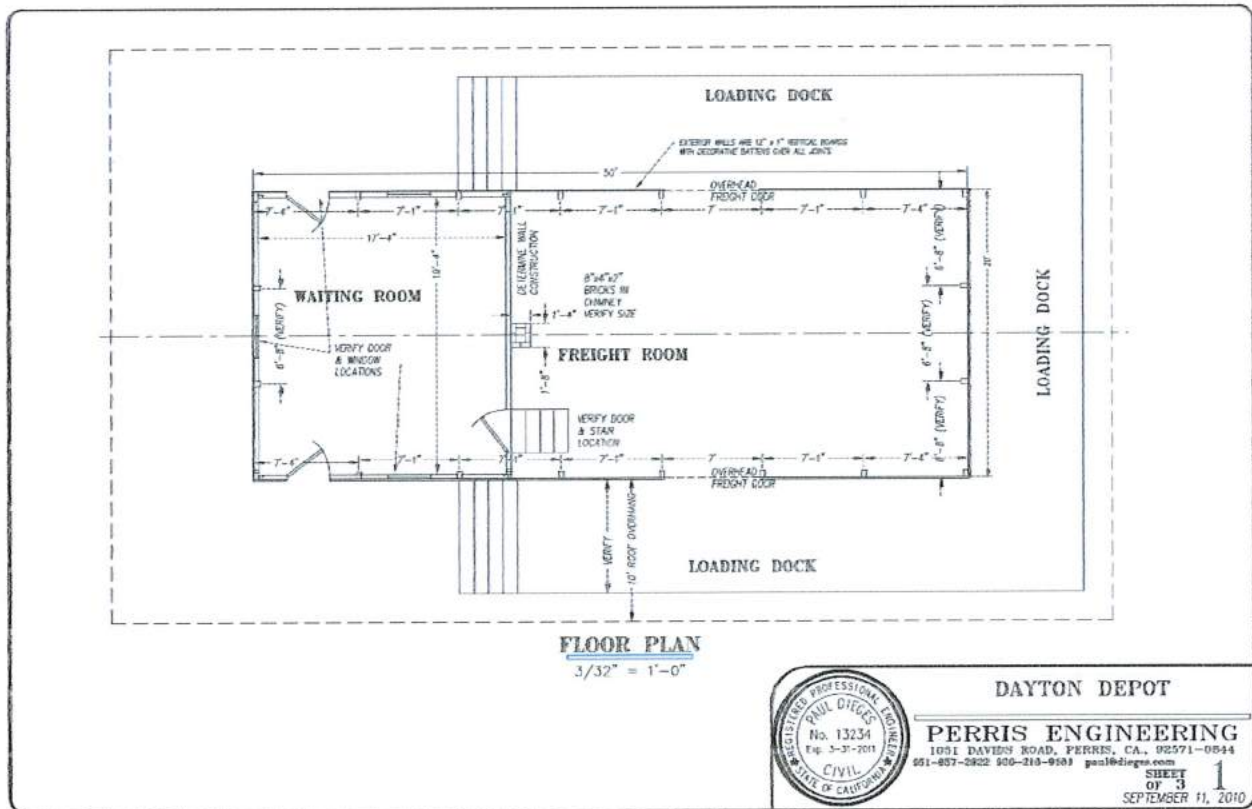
Floor plan drawn by Paul Dieges of Perris Engineering showing two main rooms of depot, passenger ticket and waiting room to left, freight room to right.
